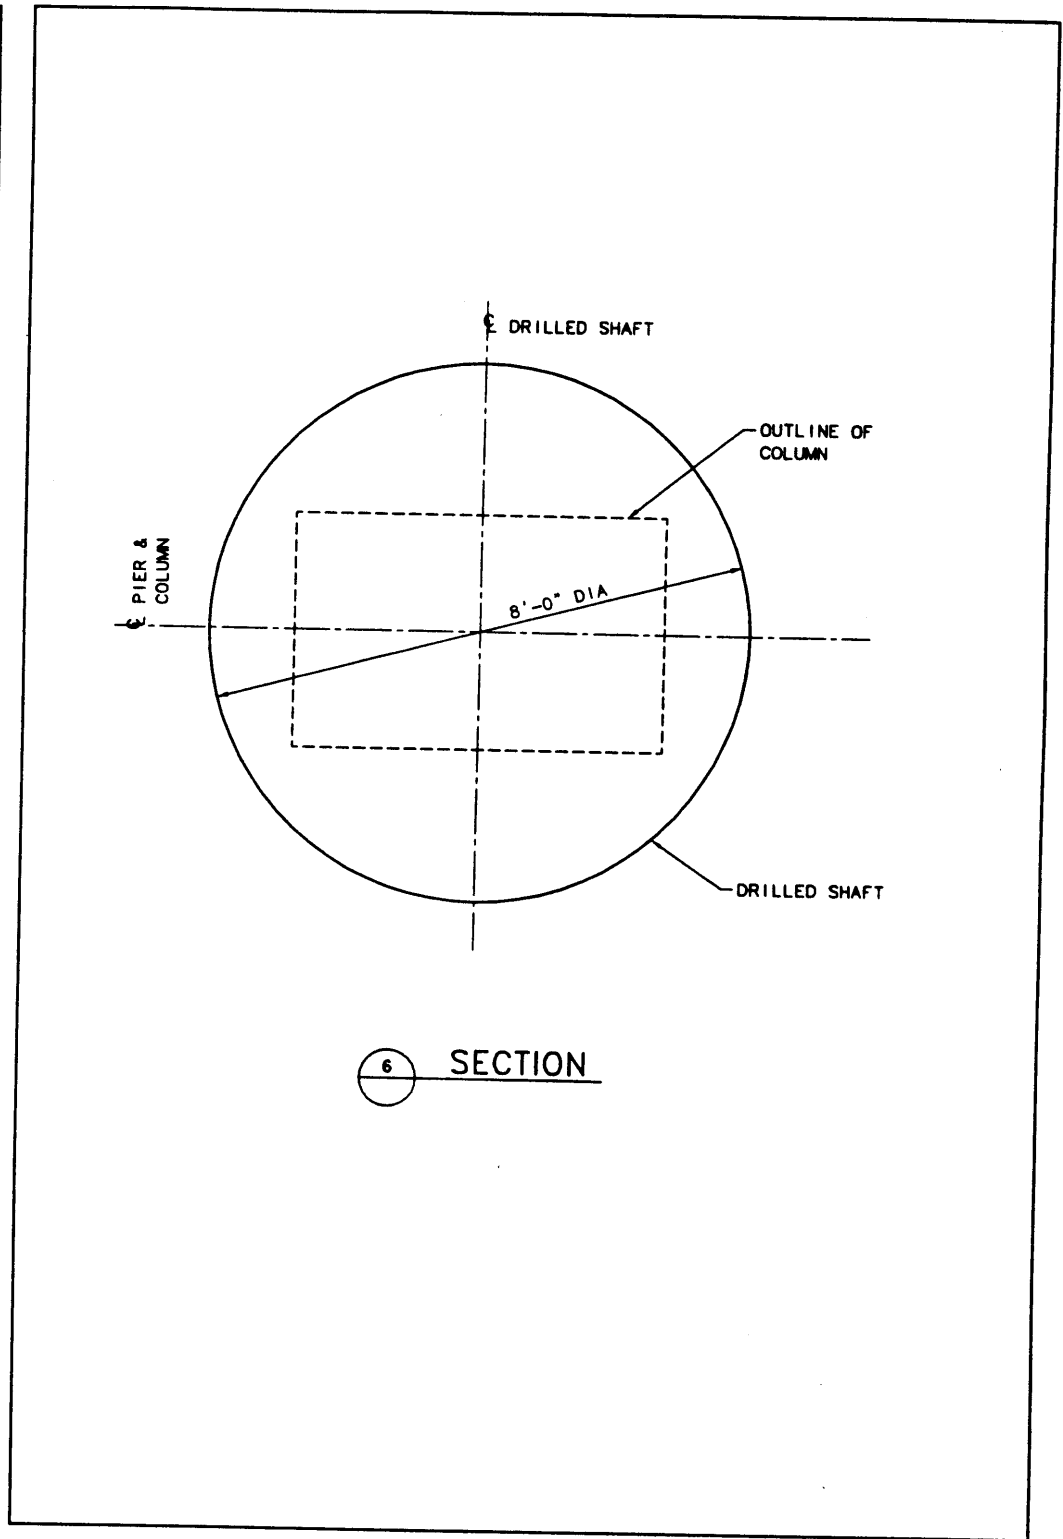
Bridge No. 6 - Horizontal Section Through Column
